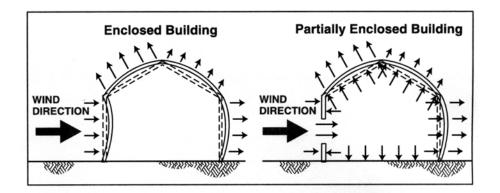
Enclosed buildings experience wind-induced pressure on the upwind walls and suction forces on the roof and lee walls. A partially enclosed building experiences increased loads due to the pressurization of the interior of the building. Reprinted with permission from the FEMA Coastal Construction Manual (FEMA, 2000).
